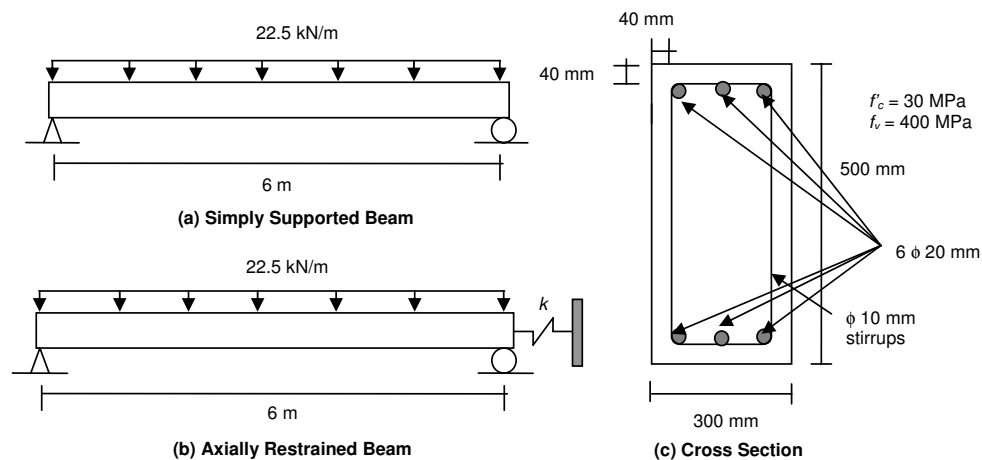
Cross section and elevation of RC beam used in parametric studies
